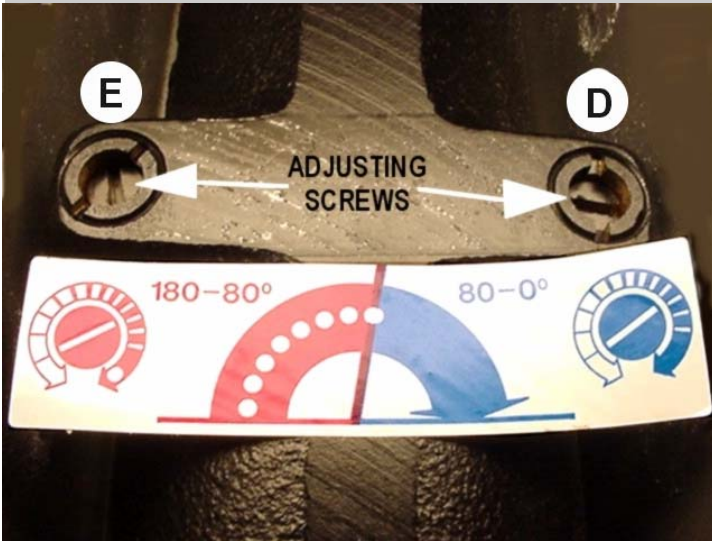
Adjusting the Speed of the Door Swing uses Valve "D"
